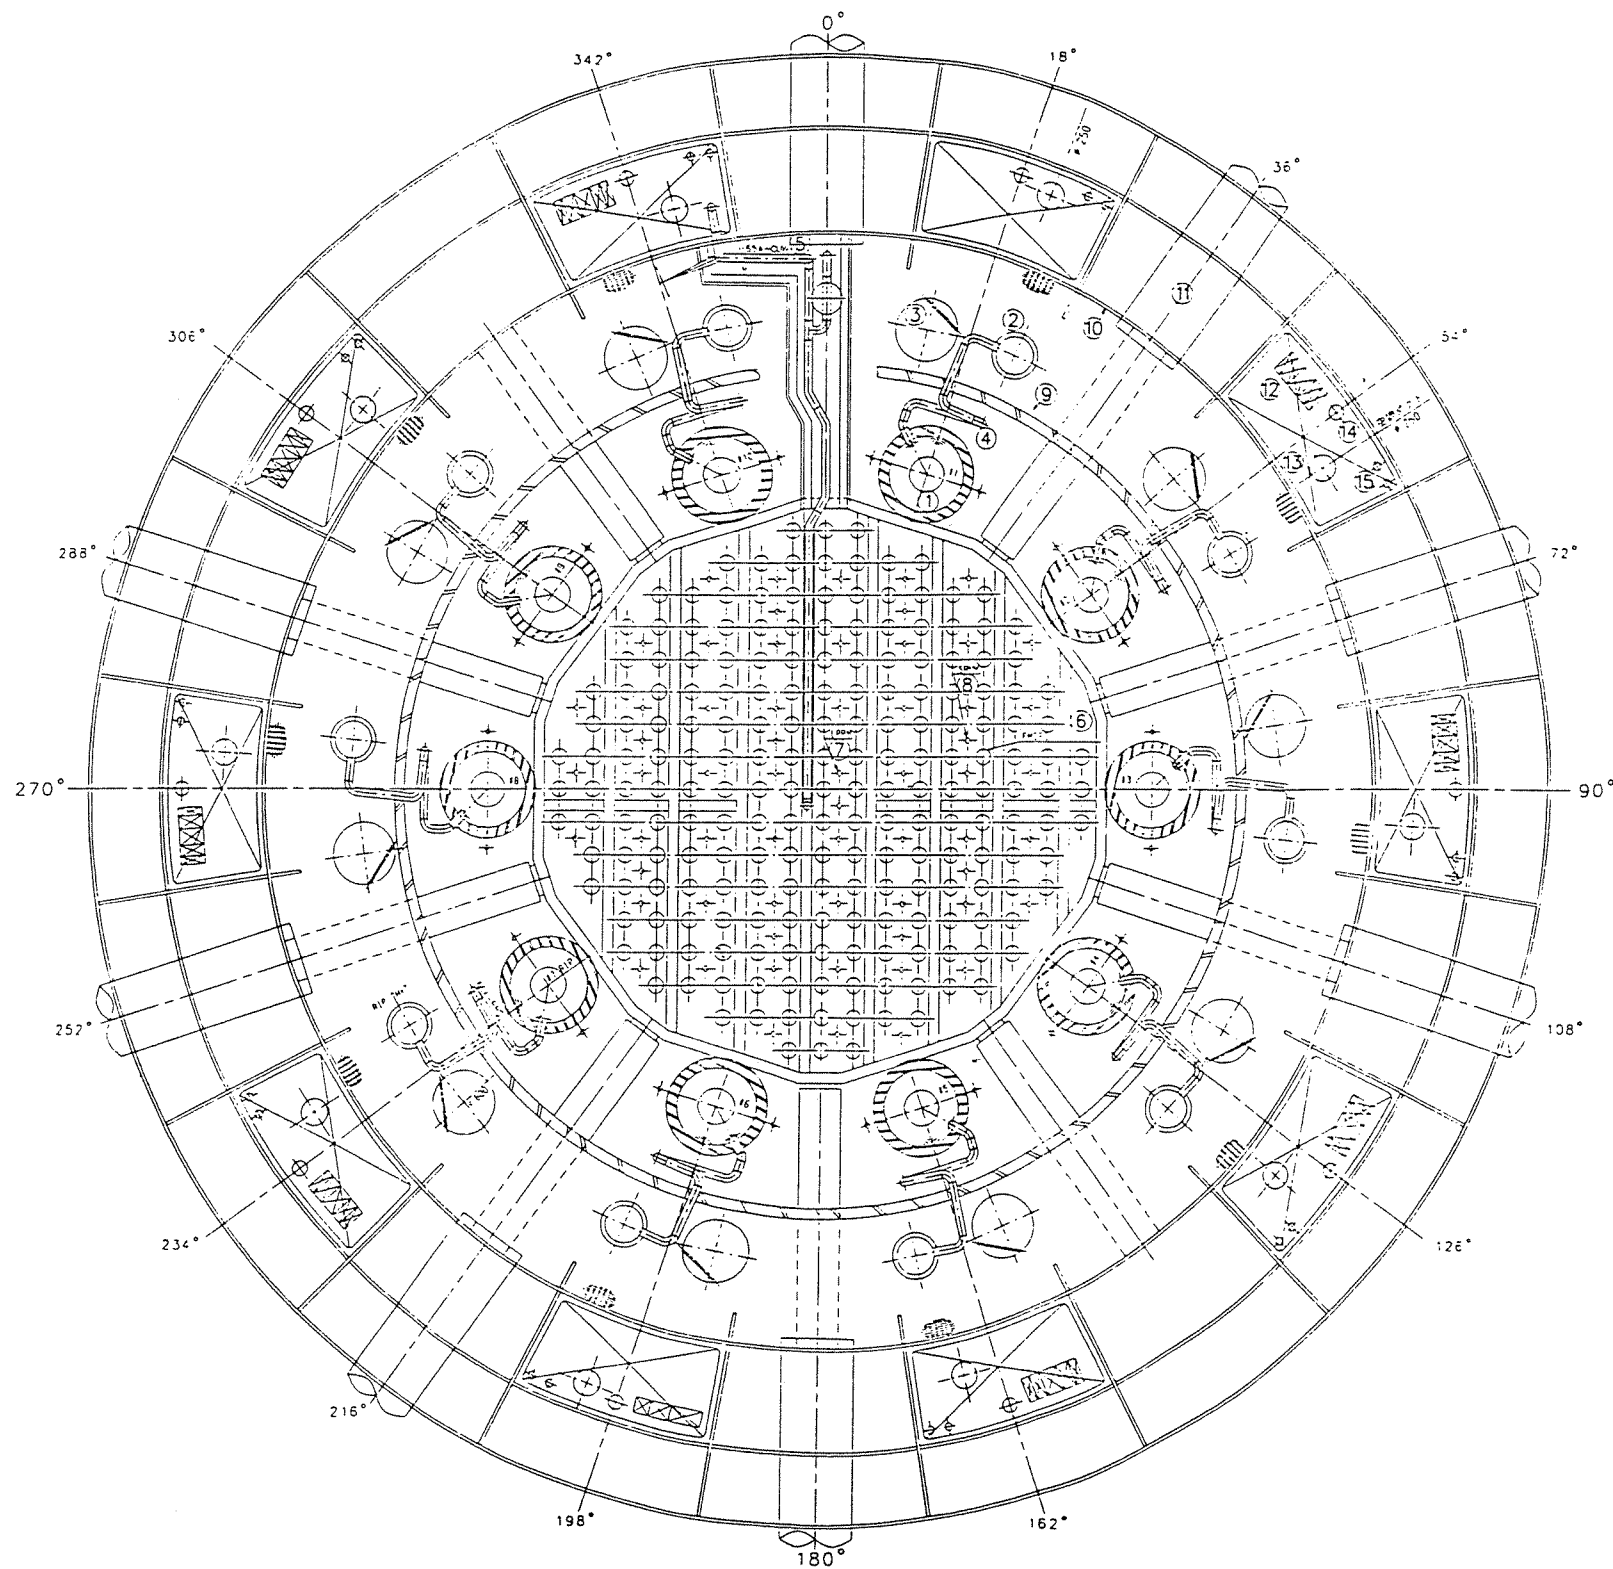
LOWER DRYWELL, ARRANGEMENT PLAN AT EL. -1850 TO 1750 mm
